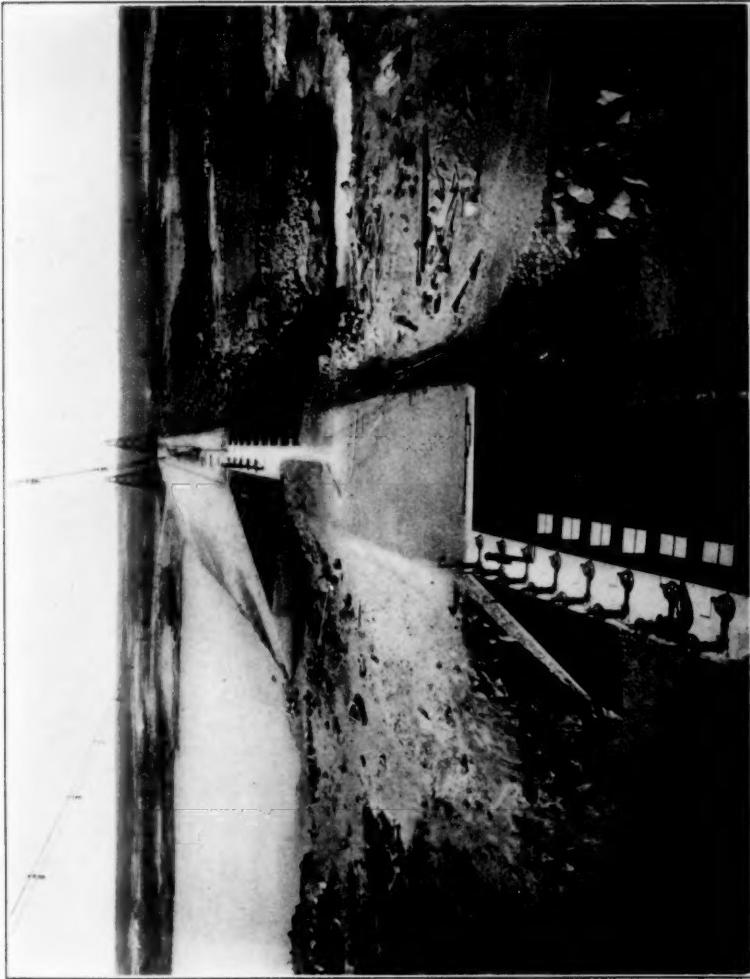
PLATE III.—Minidoka Dam, looking south. Diversion dam on Snake River, 50 feet high, showing towers and cableways, from which rock was placed. Gates of north side canal in foreground. Power units will be installed in the bays in main dam to develop about 10,000 horse-power from the water passing through to supply prior rights below.
